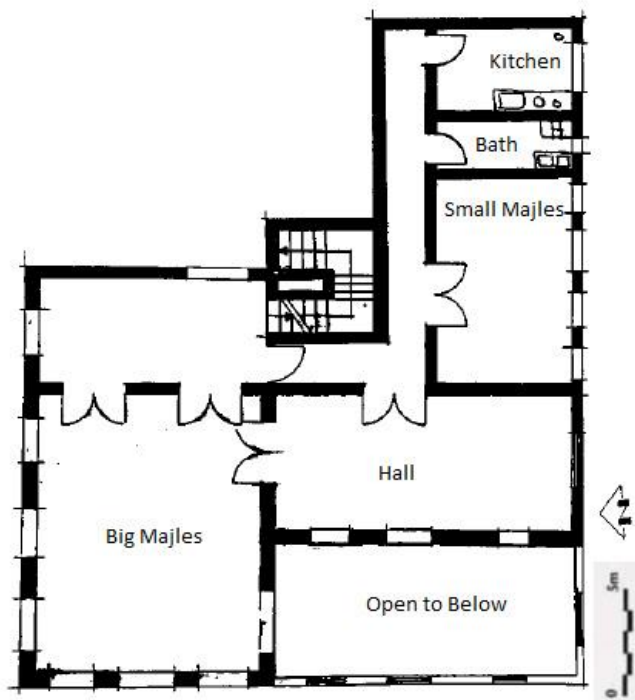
Beit Al kaf House (Fourth Floor) Mukalla (Al-Maashi, 1998)
